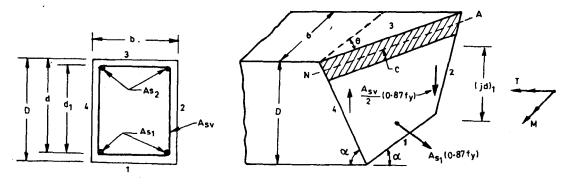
Forces Acting on Plane of Failure, Mode I
